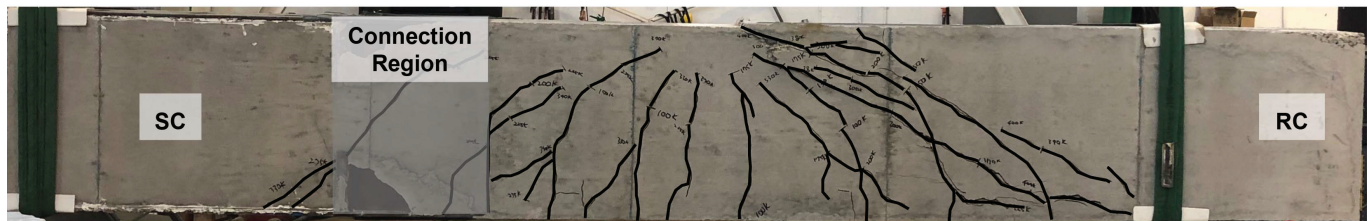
Concrete crack pattern (west side) (OOPV-C).
